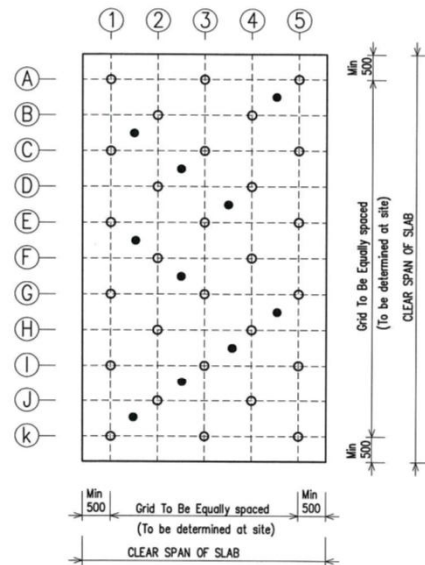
TYPICAL MATERIAL TEST AT SOFFIT SLAB / WALL
